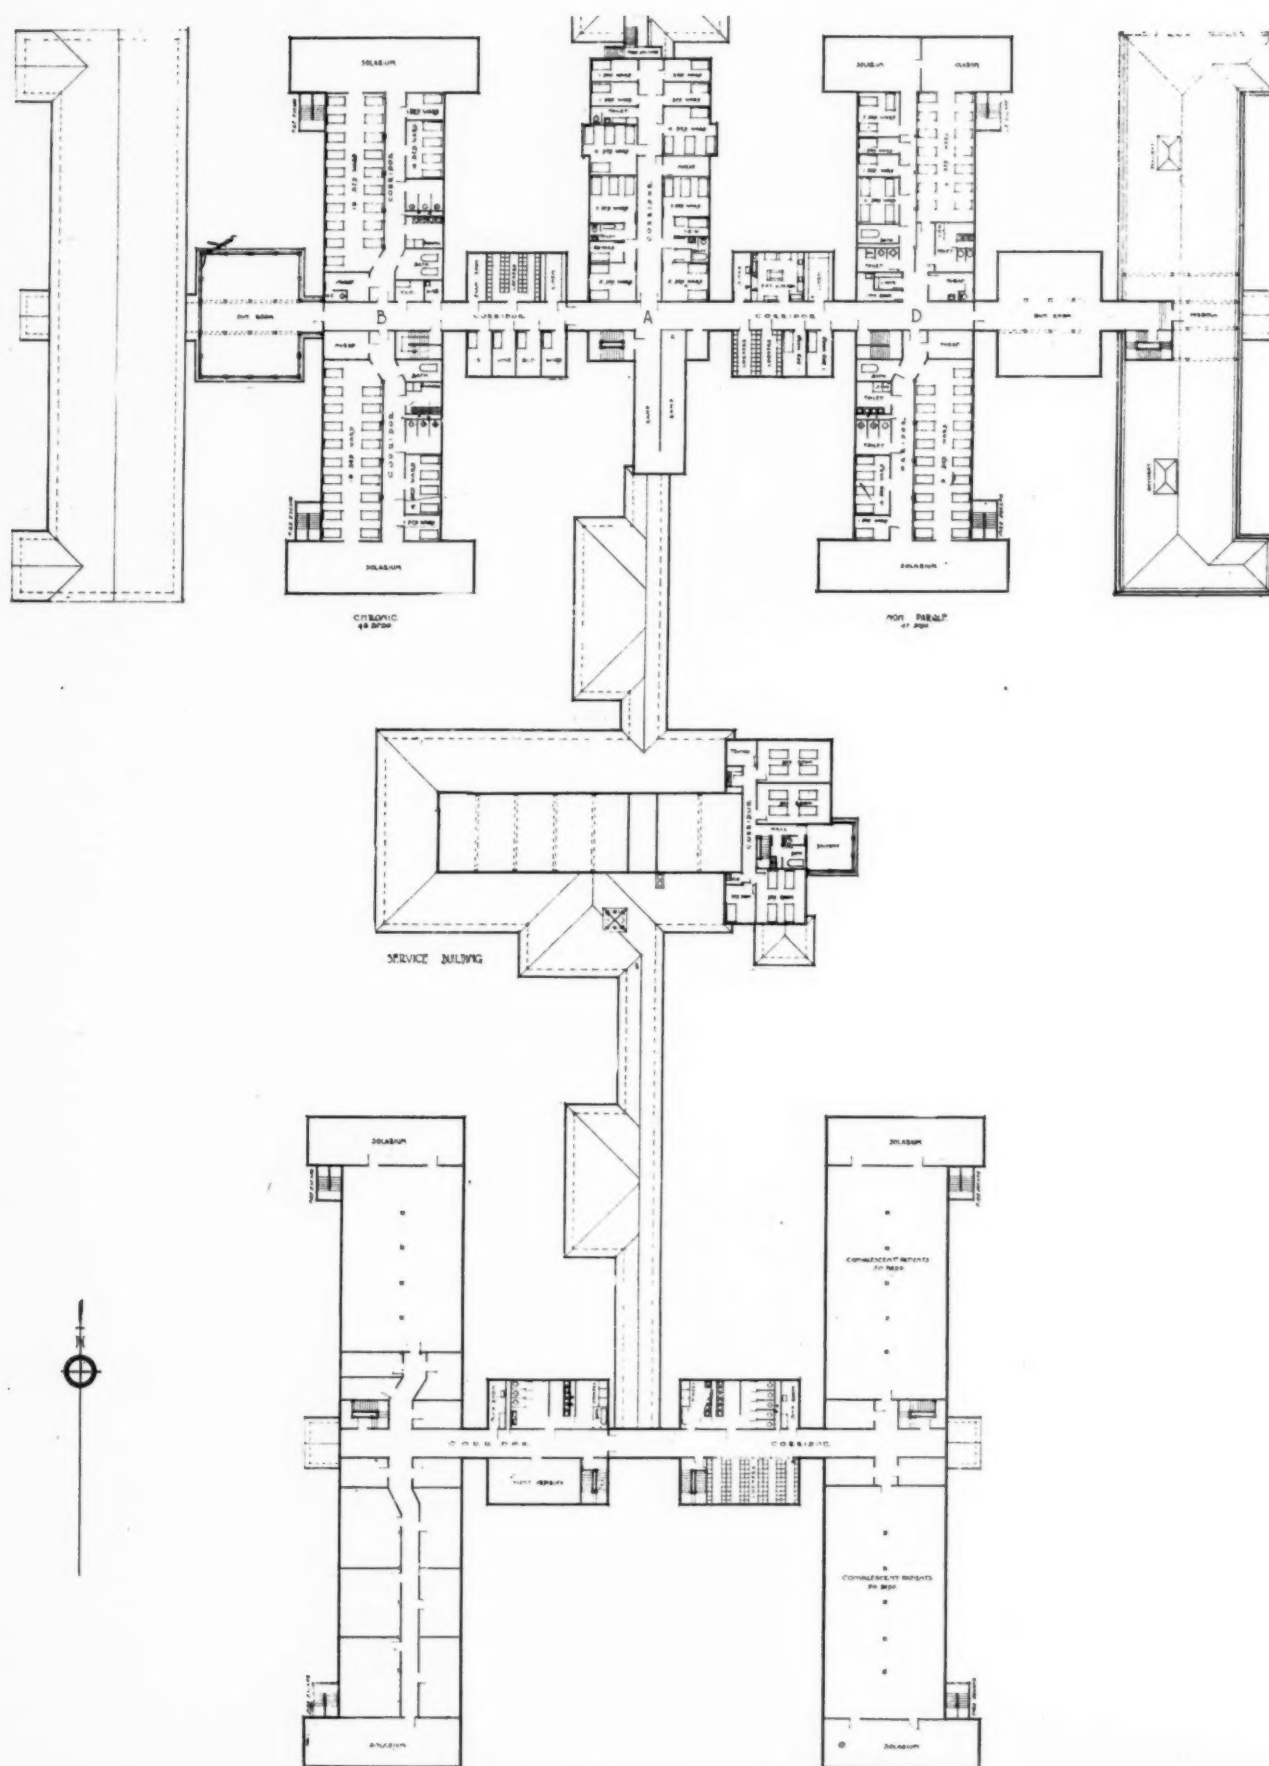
Second floor plan of the Psychopathic Hospital, London, Ontario, Canada.
